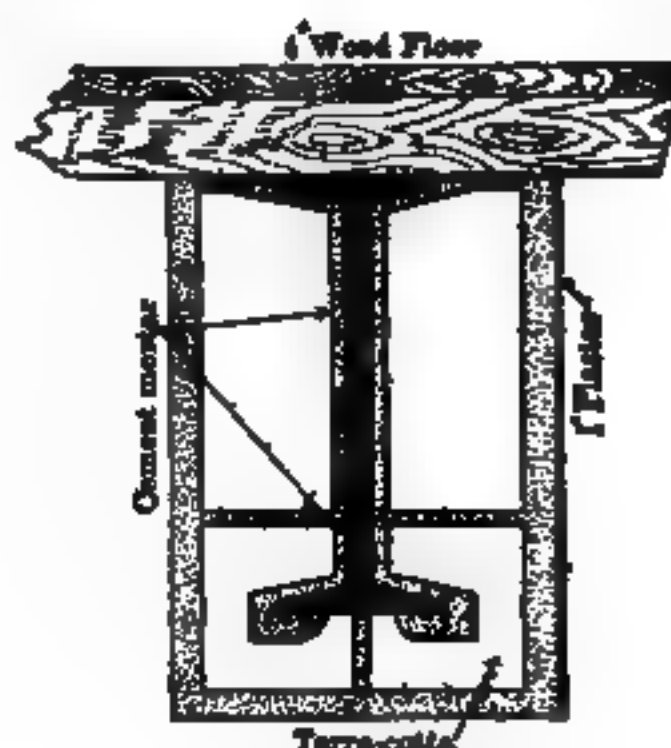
Fireproofing of Steel Columns and Beam with Tile
